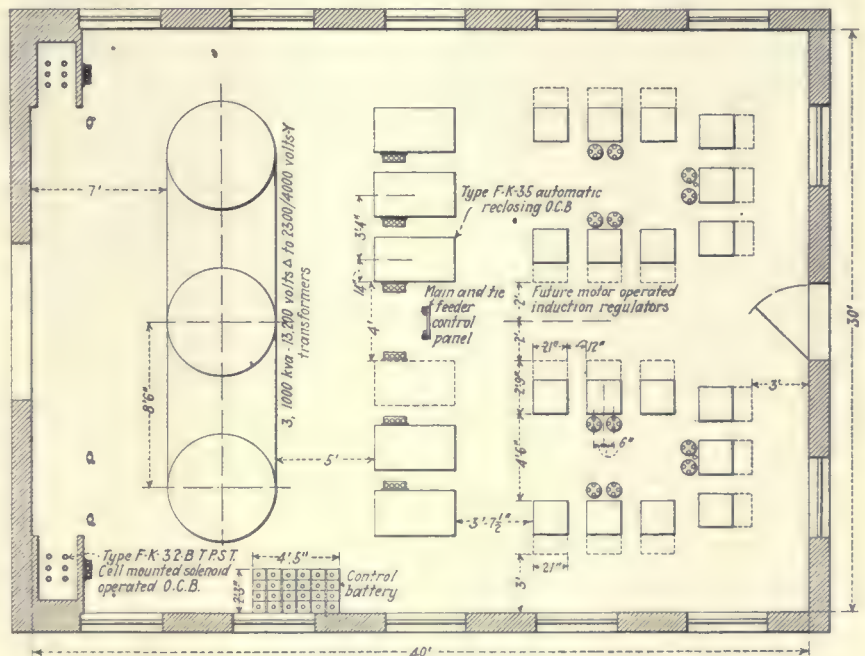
AUTOMATIC SUBSTATION LAYOUT WHICH IS CHARACTERISTIC OF PEORIA INSTALLATIONS
